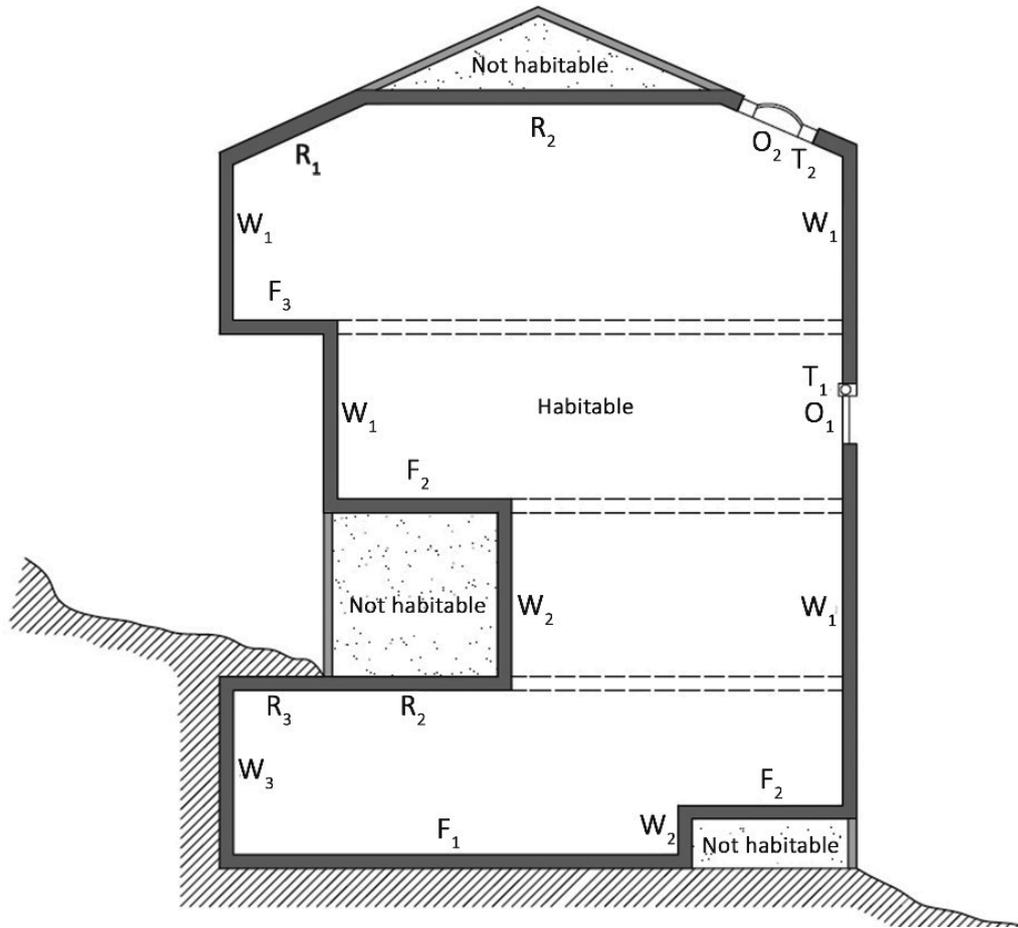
Composition of the thermal envelope of a building: Vertical external walls (W); Horizontal roofs (R); Floors (F); Openings (O); and Thermal bridges (T) [13].
